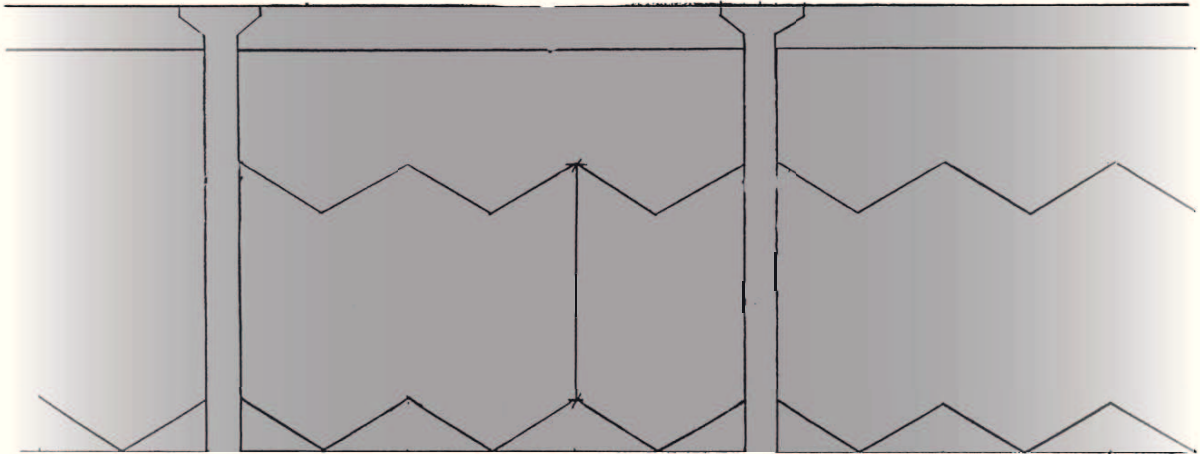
Plan showing Northern Outfall Sewer, (date unknown, post 1960)
